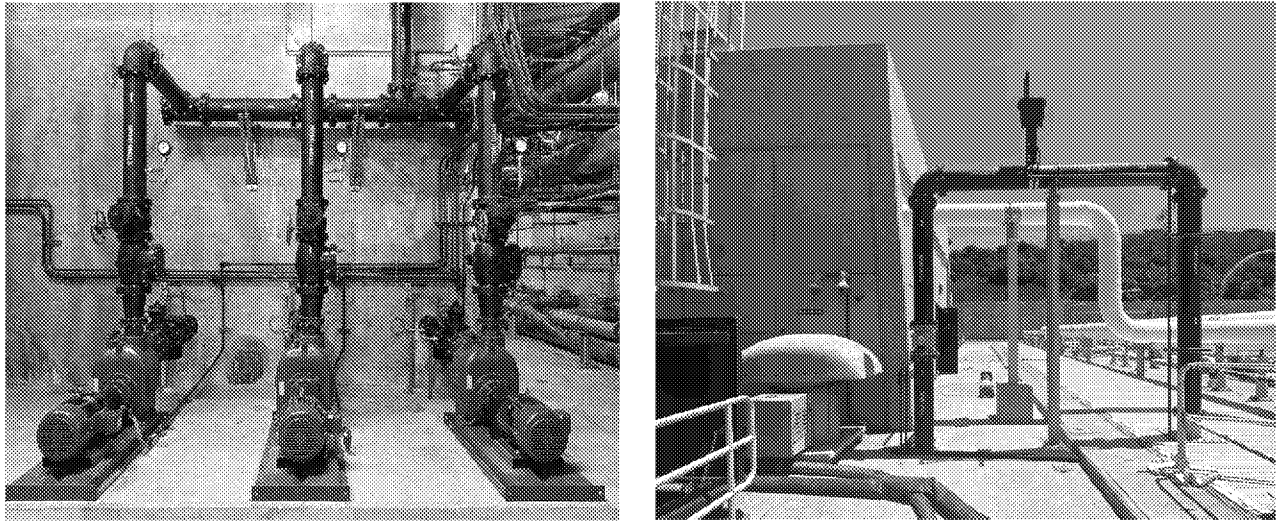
CSD No. 4 Pump Room (Left) and Effluent Piping to PBD (Right)
